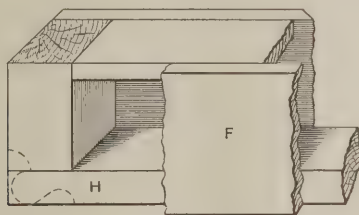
Box Construction of Bracket "F," Shown in Previous Figures.
